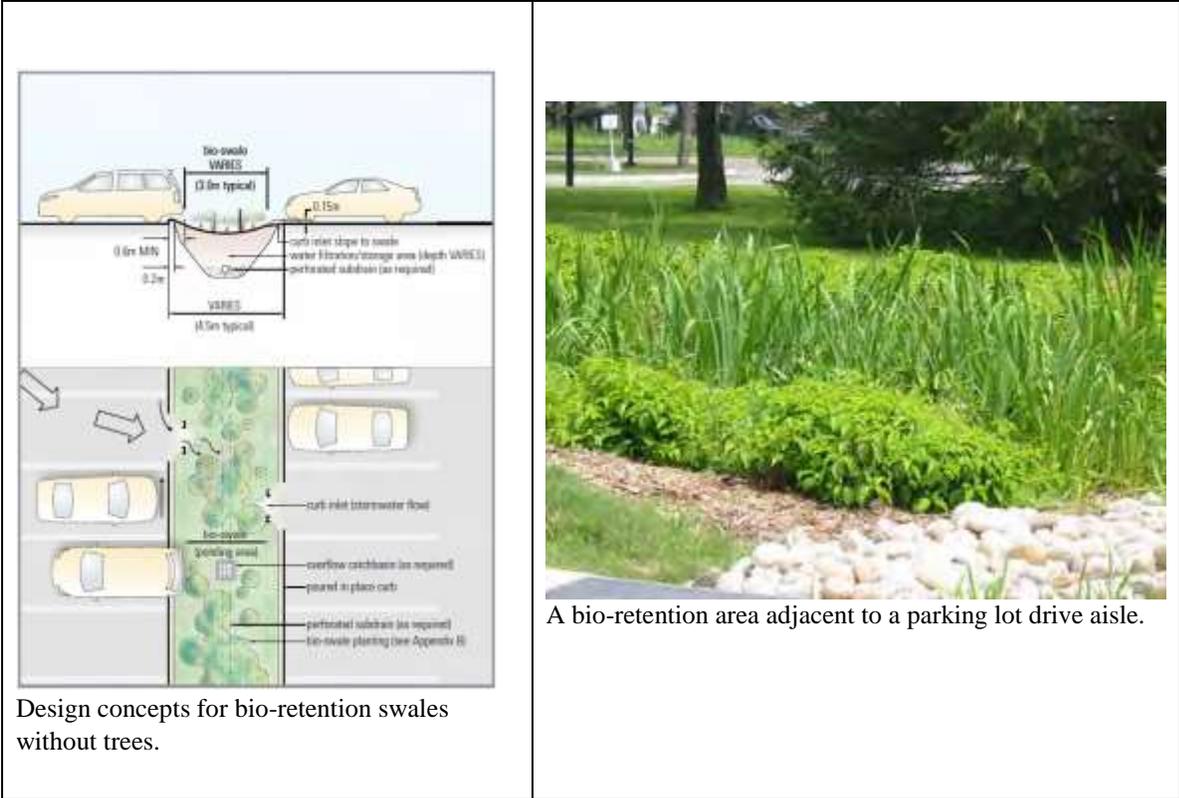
Images from Toronto’s Design Guidelines for ‘Greening’ Surface Parking Lots, Toronto City Planning, January 2013.
